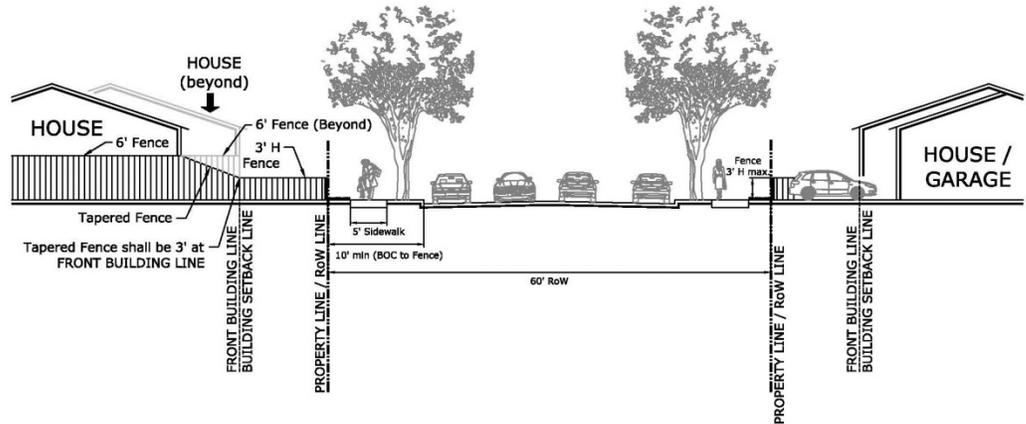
(c) – Typical Cross Section with Landscaped Area and Sidewalk
